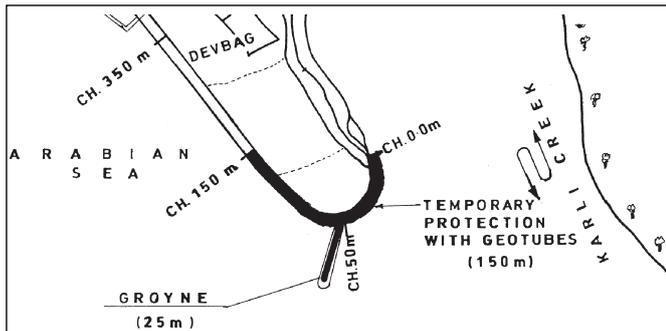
Layout plan of the coastal protection work at Devbag, Maharashtra
